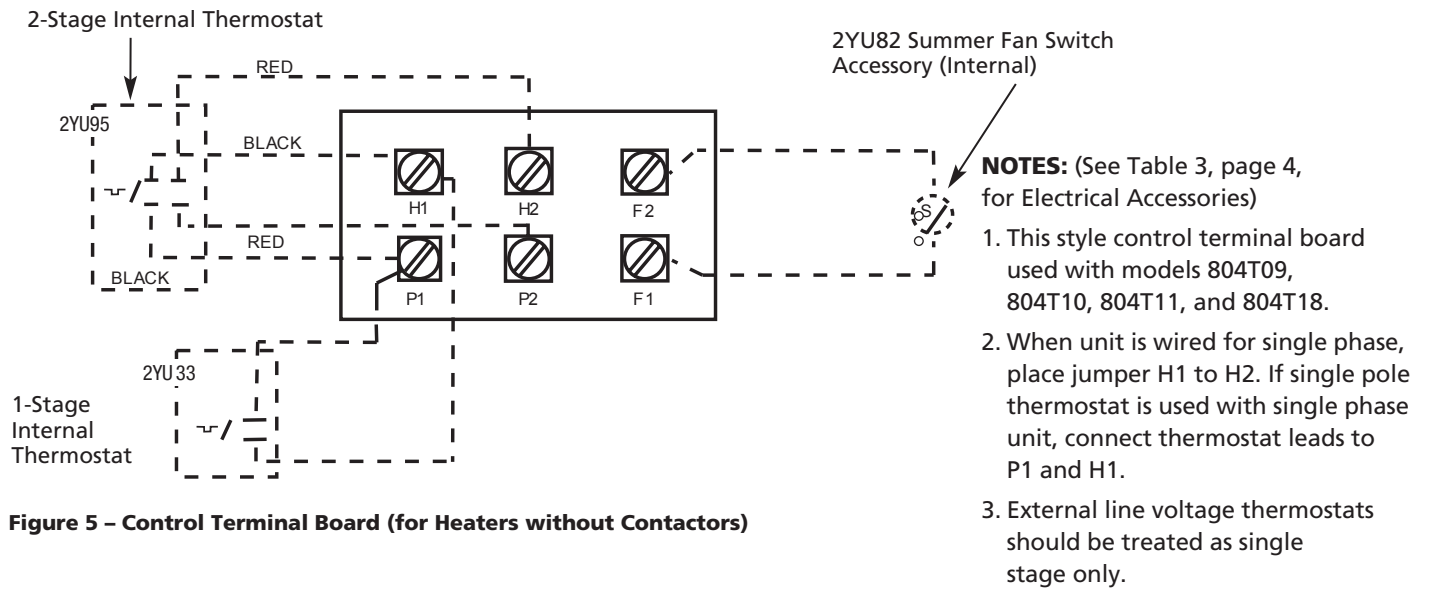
Control Terminal Board (for Heaters without Contactors)
